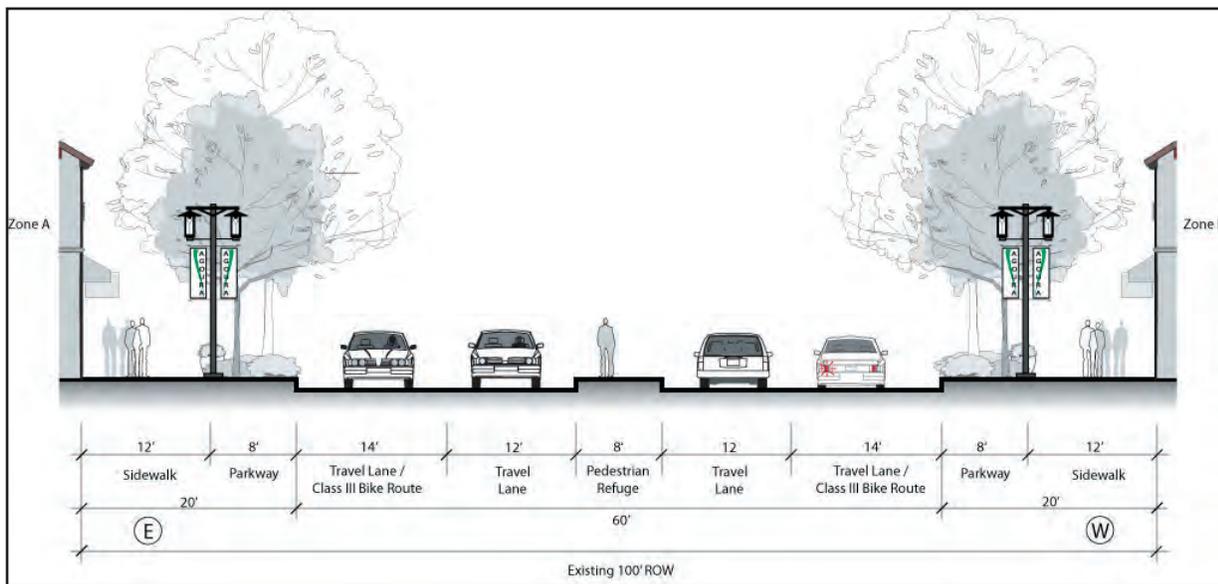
Future Kanan Road street section (at the roundabout)
